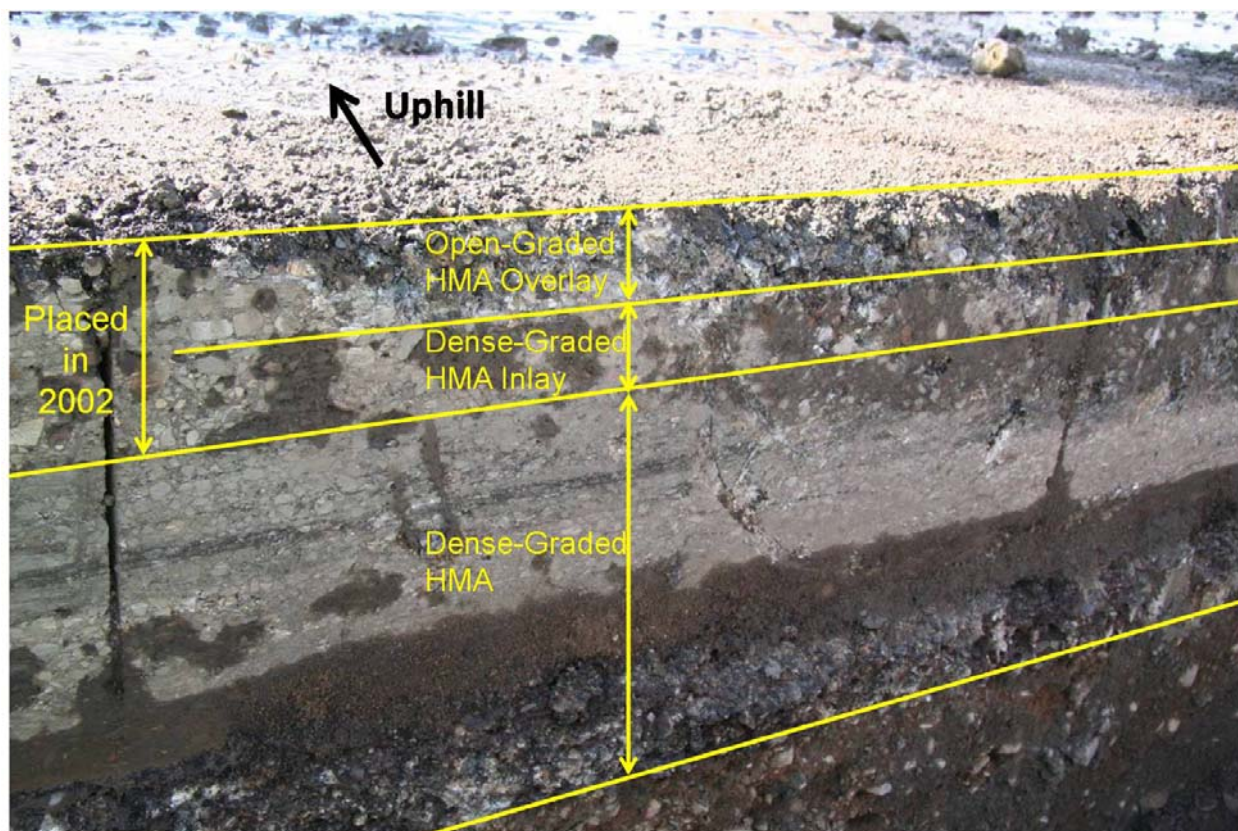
Garden Valley – Roberts Creek Trench Wall Approximately 1½ Hours after Excavation.
